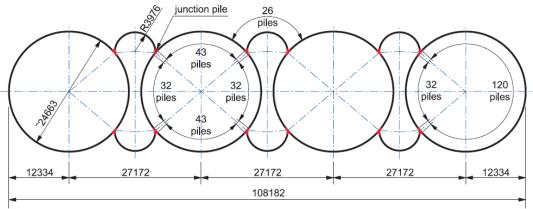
Plan View of Cell Arrangement at Voisey's Bay Marine Terminal
